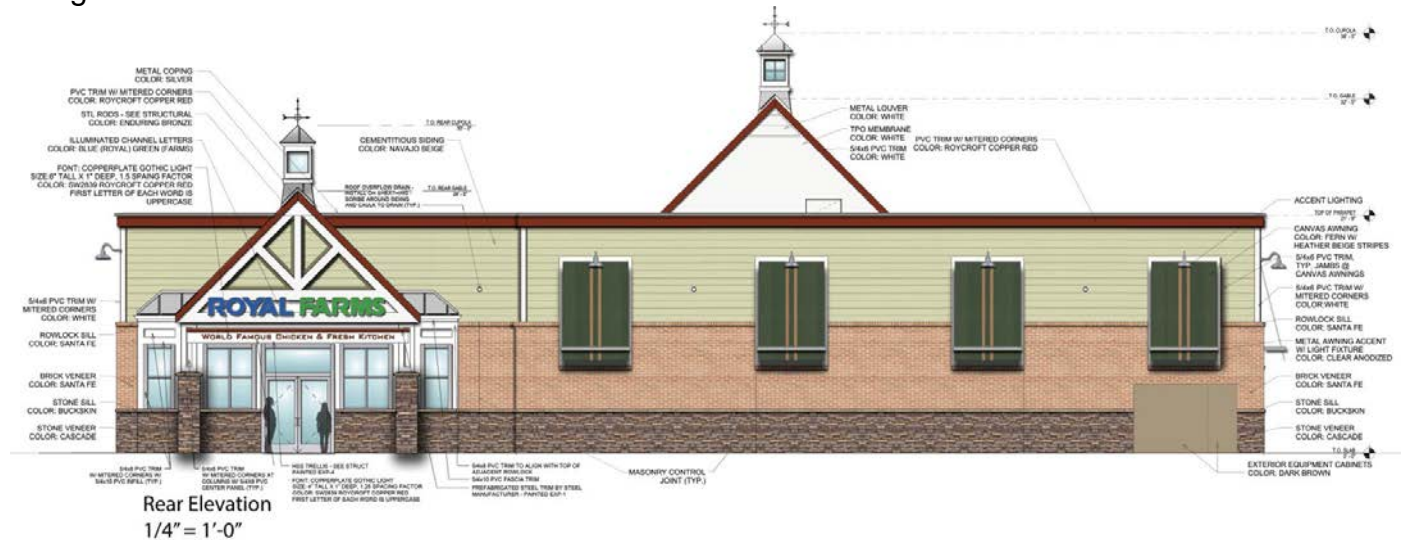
Revised Rear Elevation for the Royal Farms building
